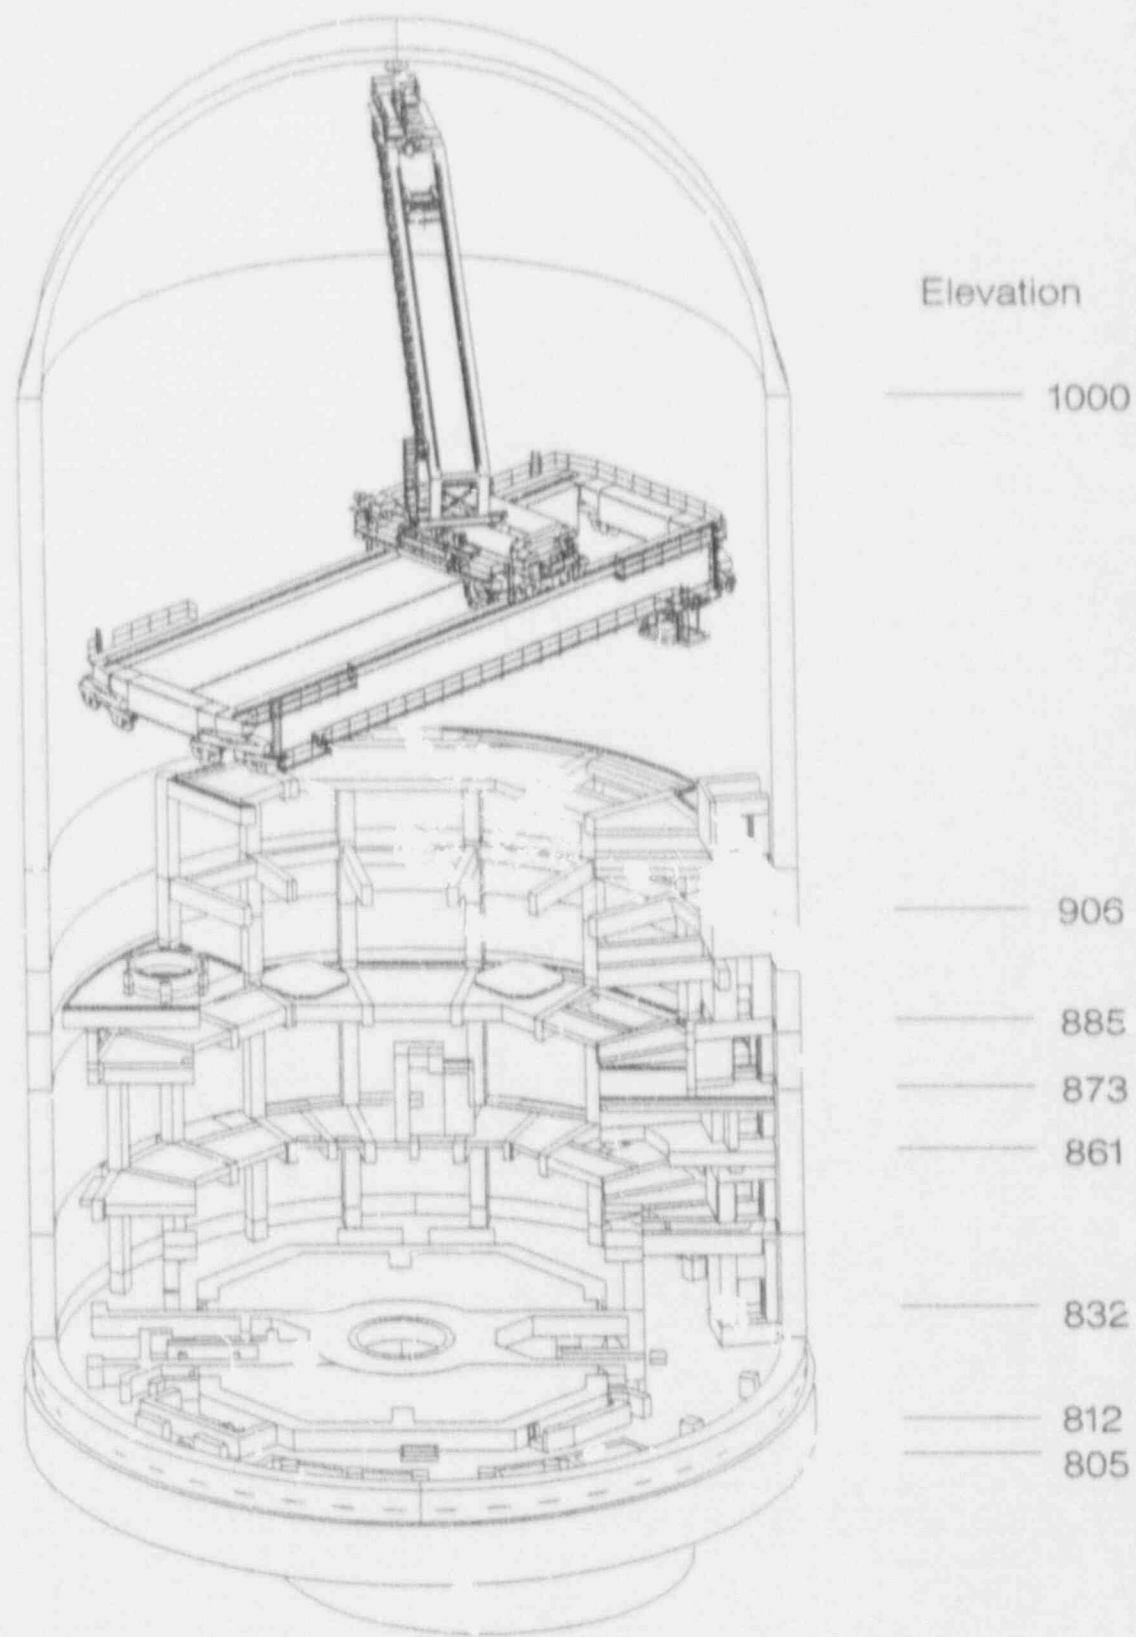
Containment Layout - Floors and Containment Spray Piping
